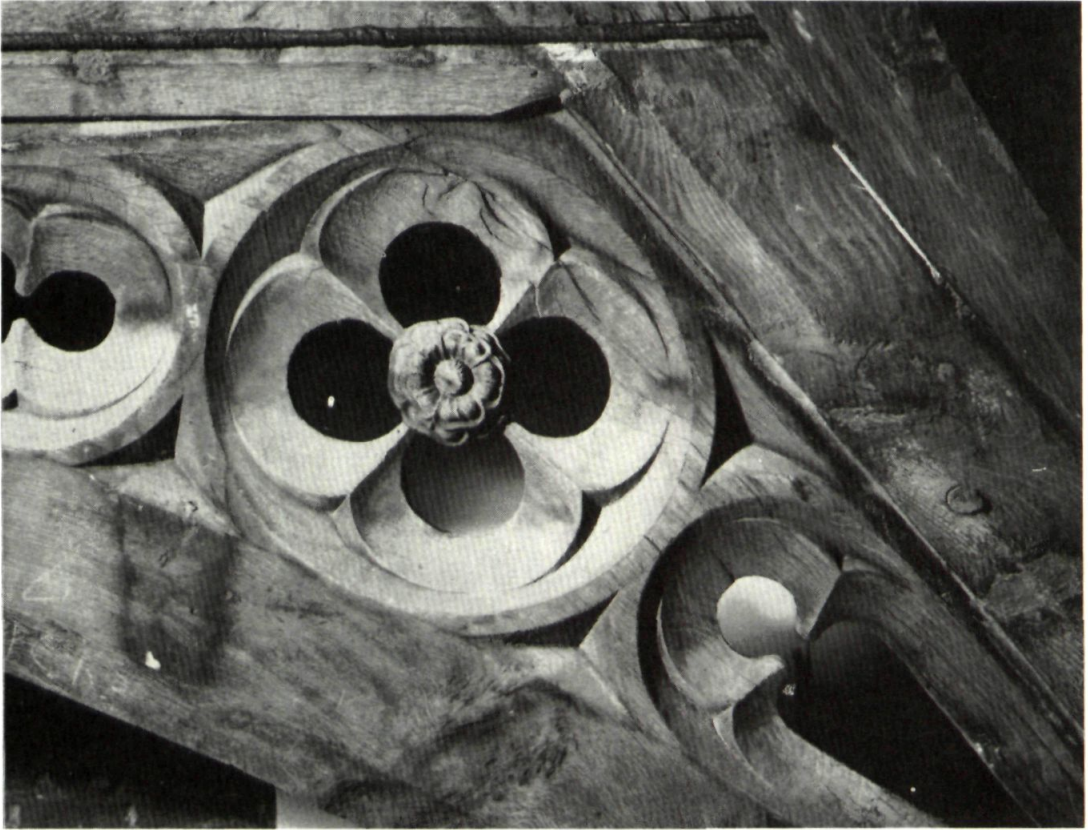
Roof of Prior's Hall. Spandrel detail (Truss IV, West, from N). *Photo: John Crook.
